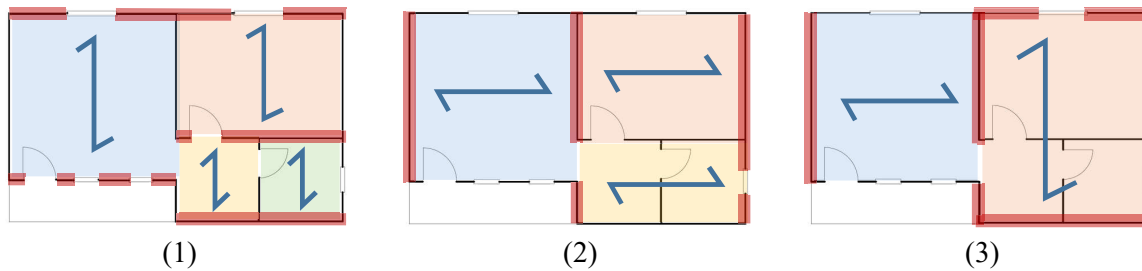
The possible approaches for defining the structural/spanning zones in a small 3DP cob house with indication for spanning direction. (1) Alternative with four structural zones; (2) Alternative with three structural zones; (3) Alternative with two structural zones. The load-bearing walls are highlighted in red.
